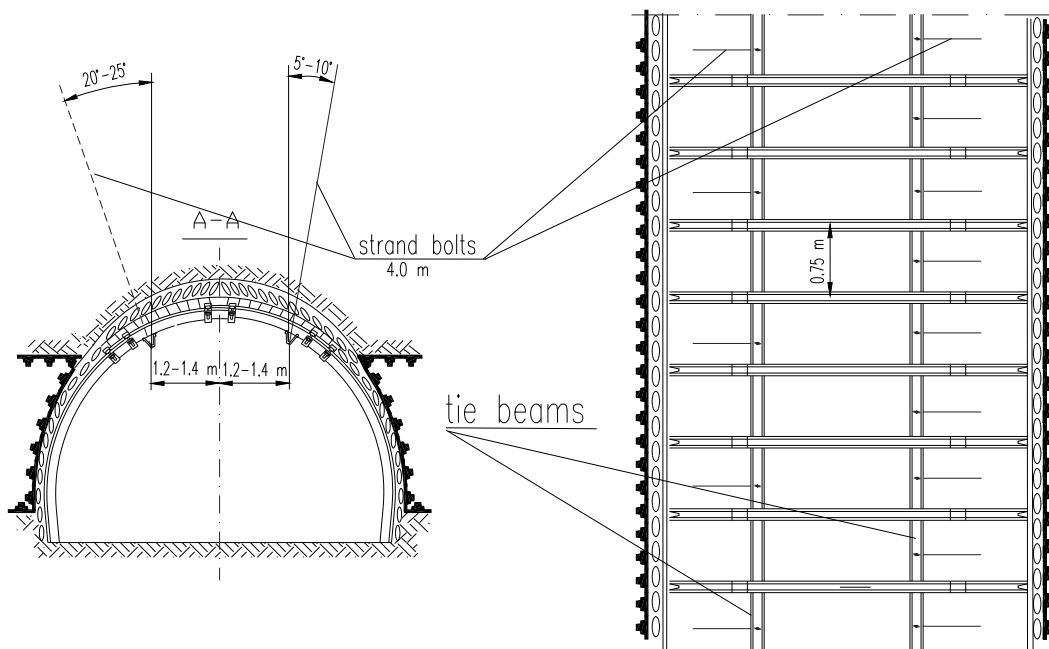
Support system in the roadway B-7 (seam 403/3) in the testing section.
